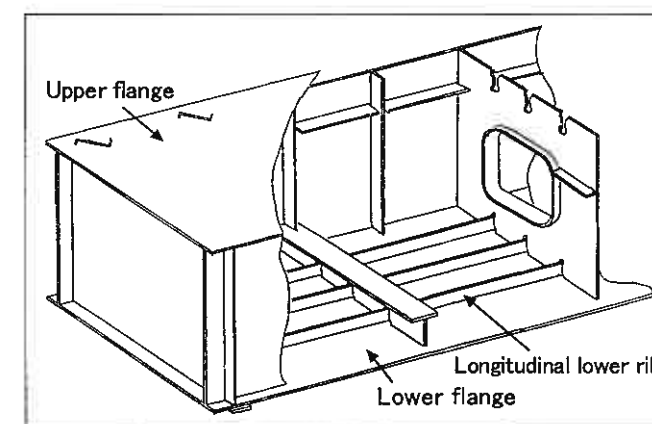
Flange-to-rib fillet welding of box girders is a typical application of DW-200.
